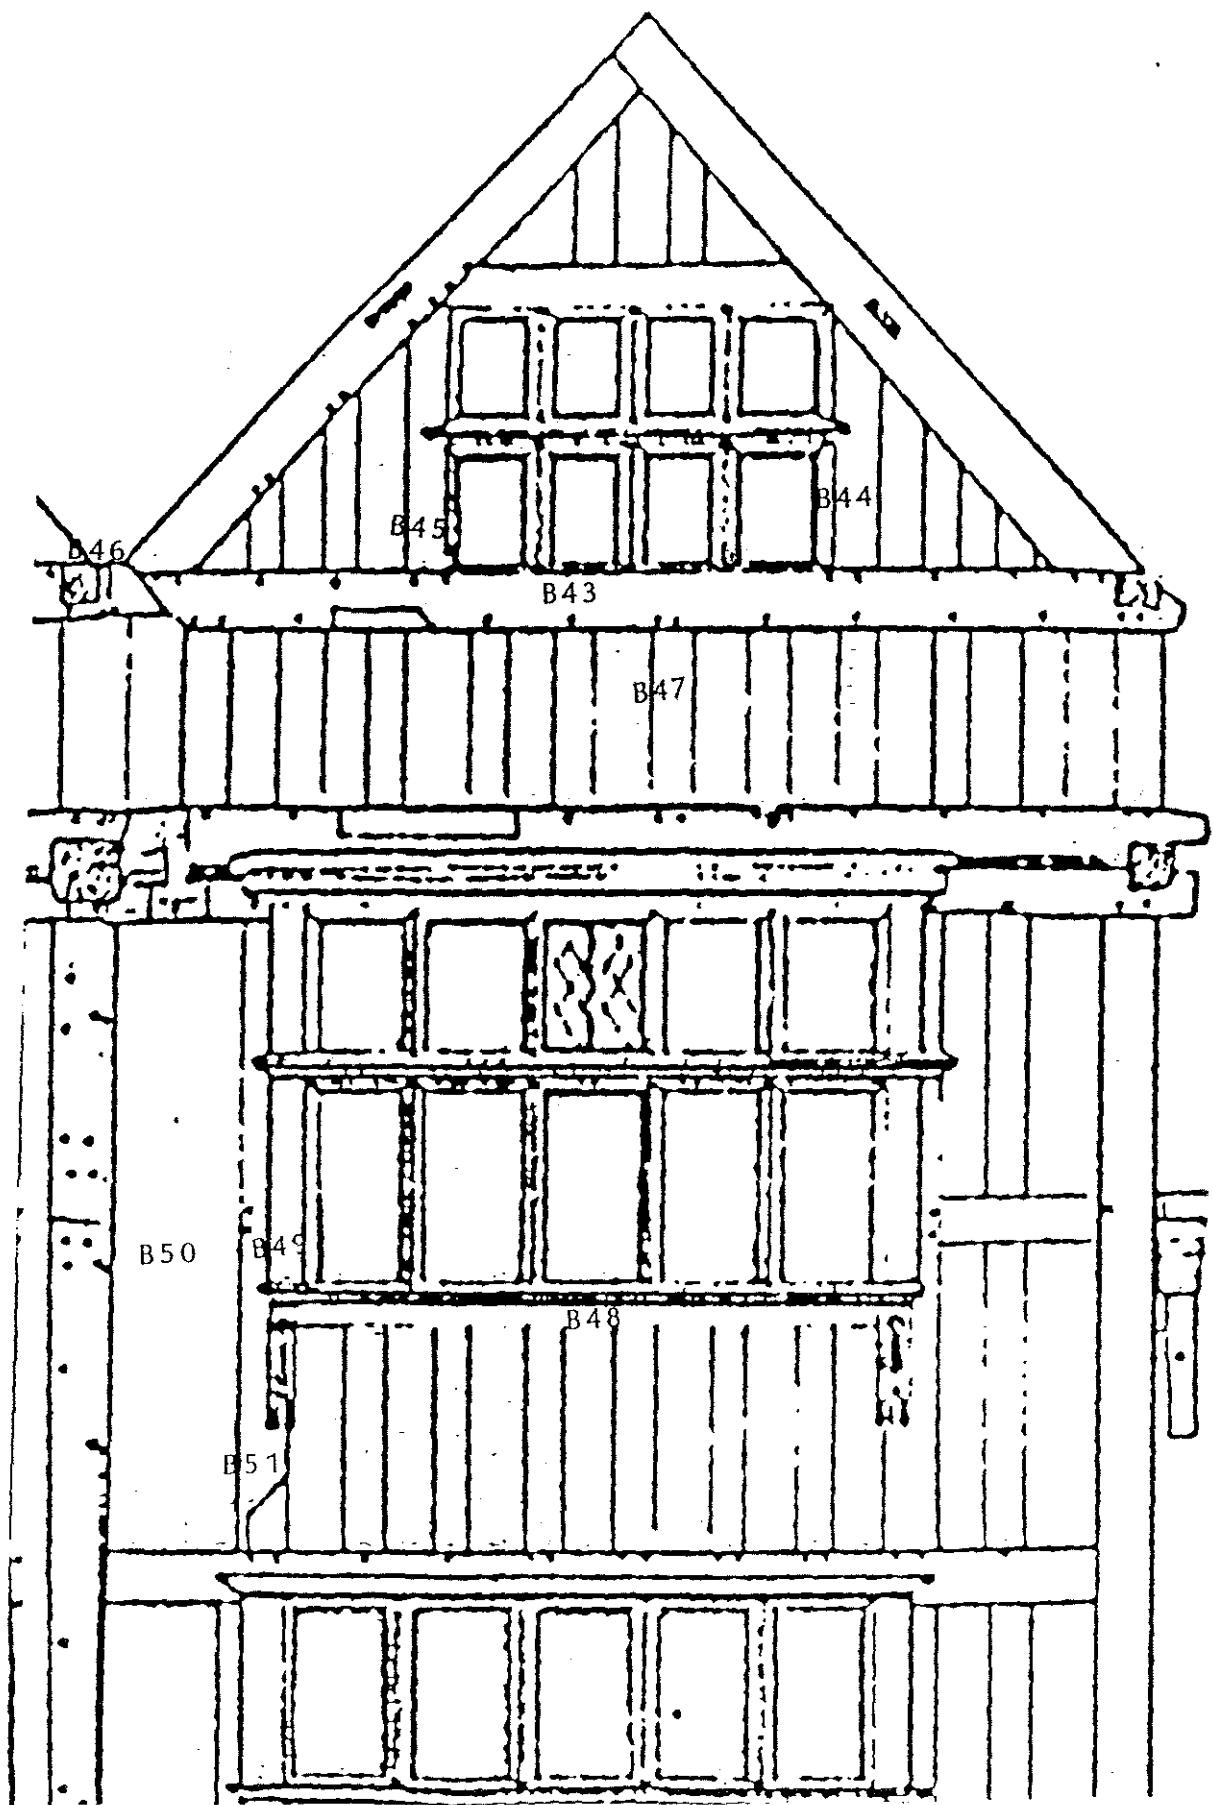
26 Westgate Street, Gloucester - sketch plan to show location of samples GLO-B43-51 from the east facade along Maverdine Lane in bay 5
